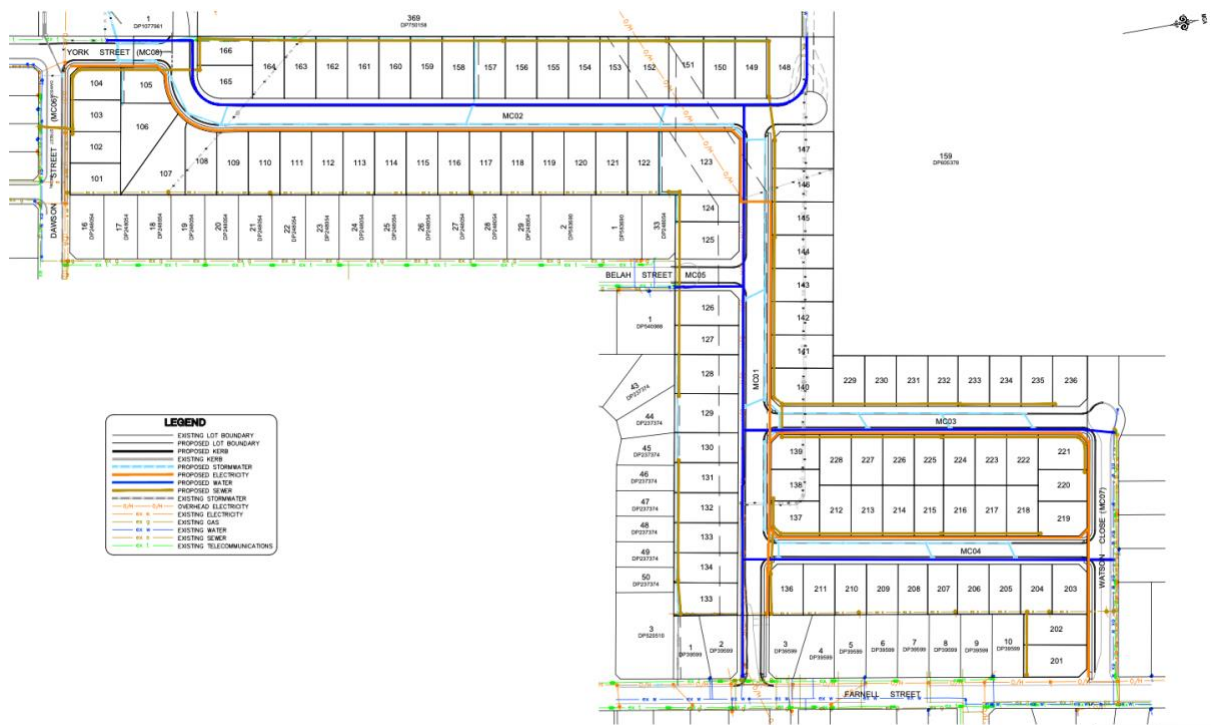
Servicing Plan, showing proposed stormwater (light Blue dash line) and sewer (Brown line).
